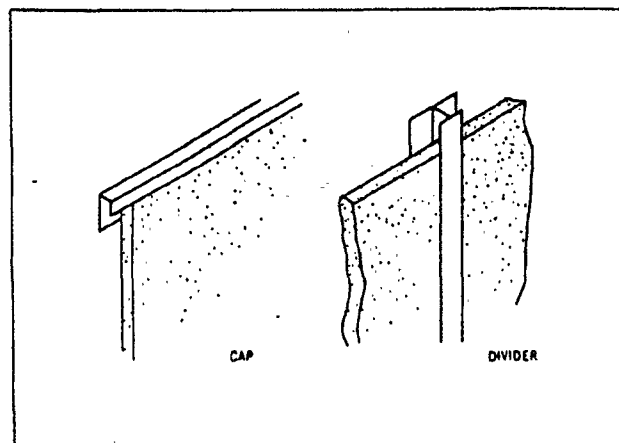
MOULDINGS - To prevent "drumming", add face nailing or adhesive to these mouldings.
